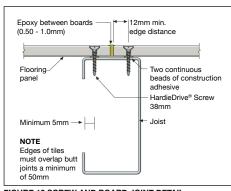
SCREW AND BOARD JOINT DETAIL
